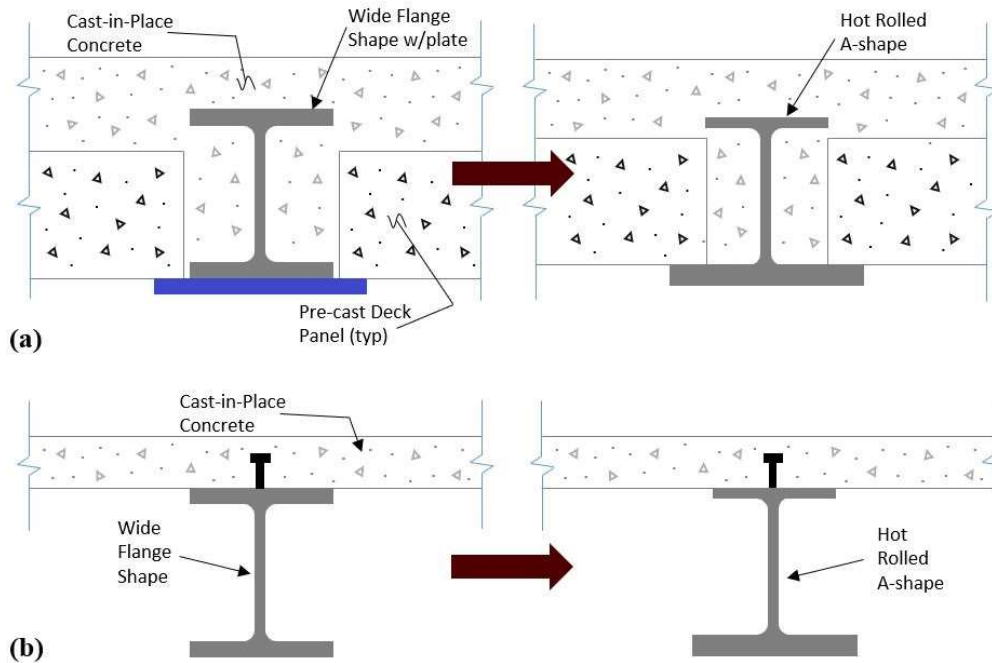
Potential use of A-shapes in-floor systems: (a) pre-cast deck panel composite floor system (b) cast-in-place composite floor systems
